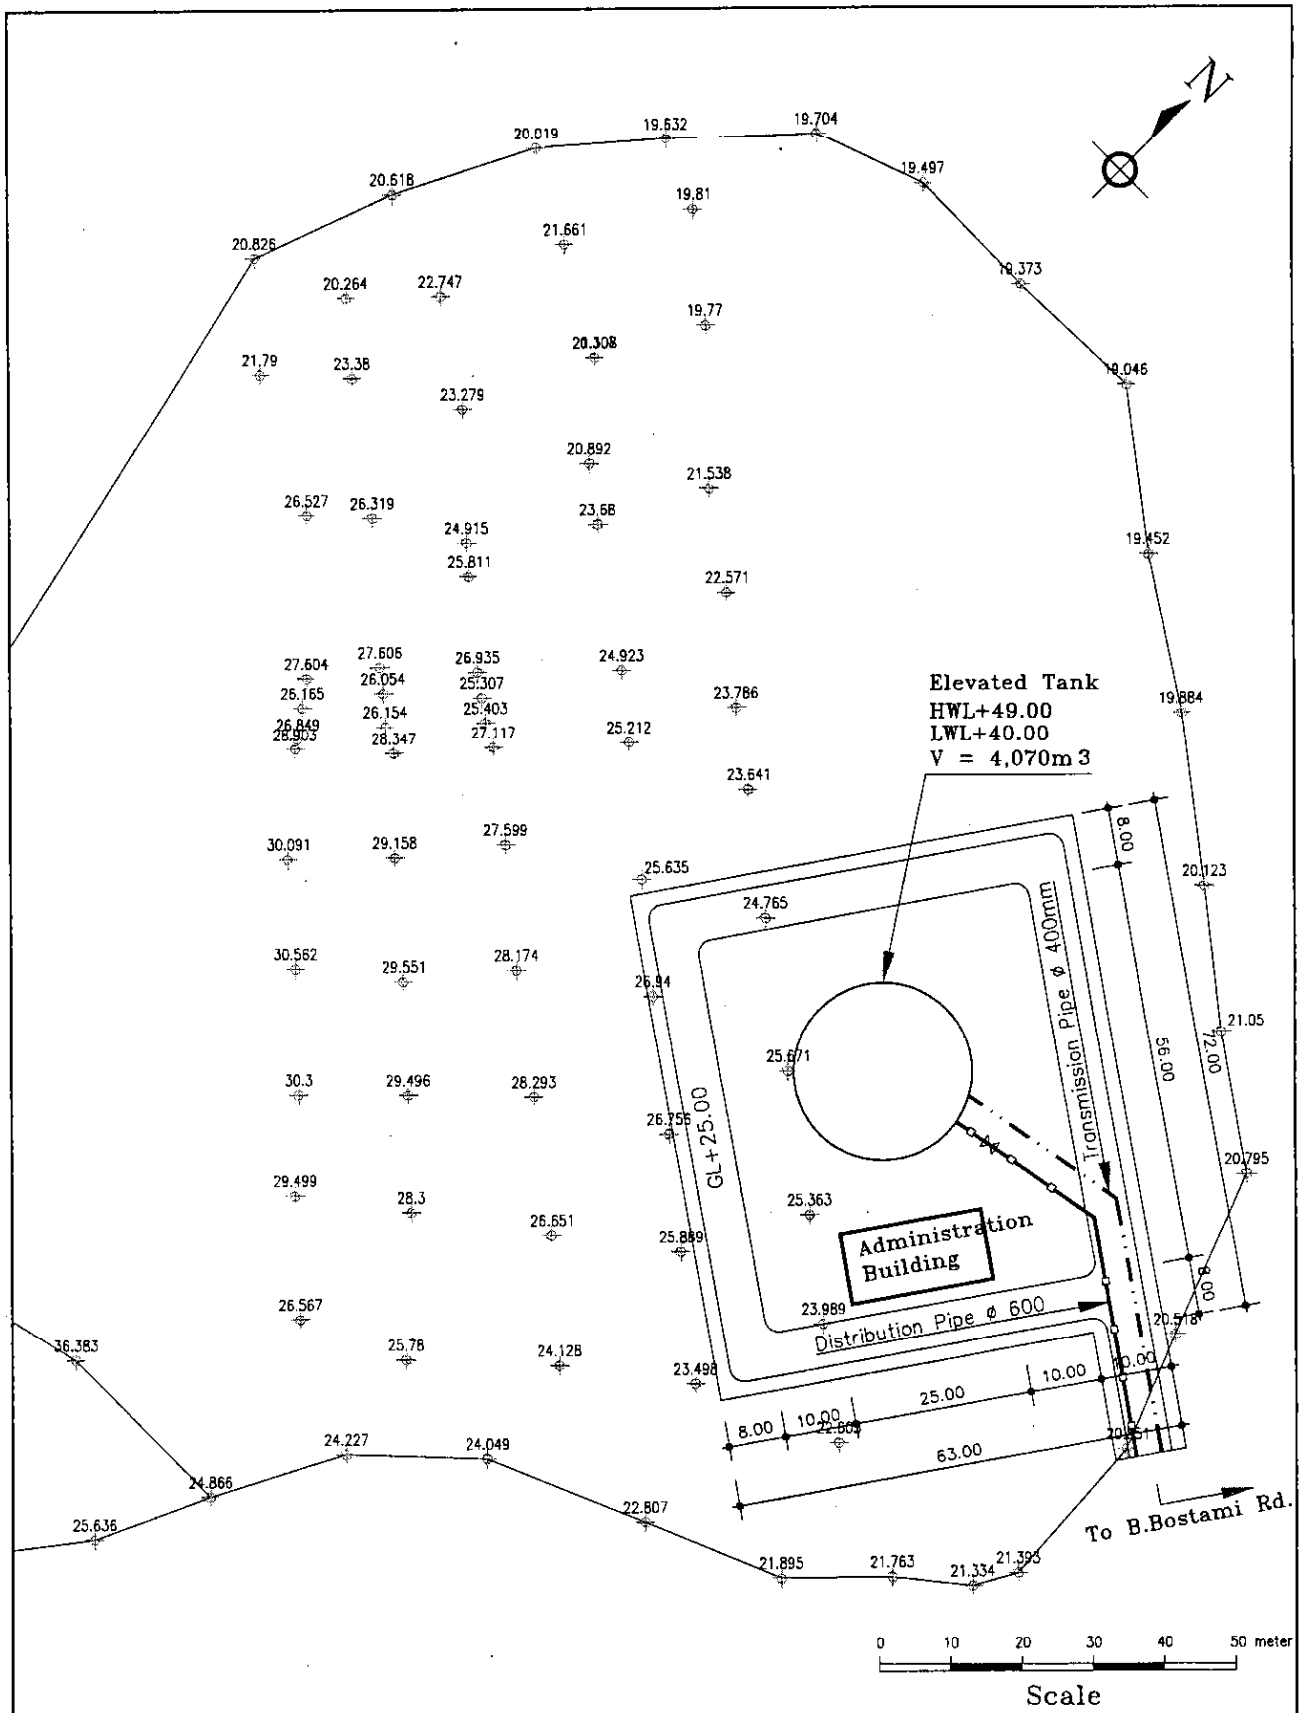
LAYOUT PLAN OF PROPOSED NASIRABAD RESERVOIR (Alternative Case I-b-2)
